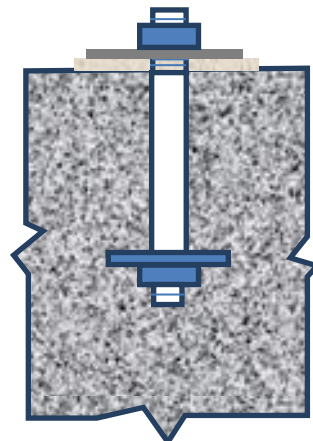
Cast-in-place anchorage with straight stem and embedded plate.
